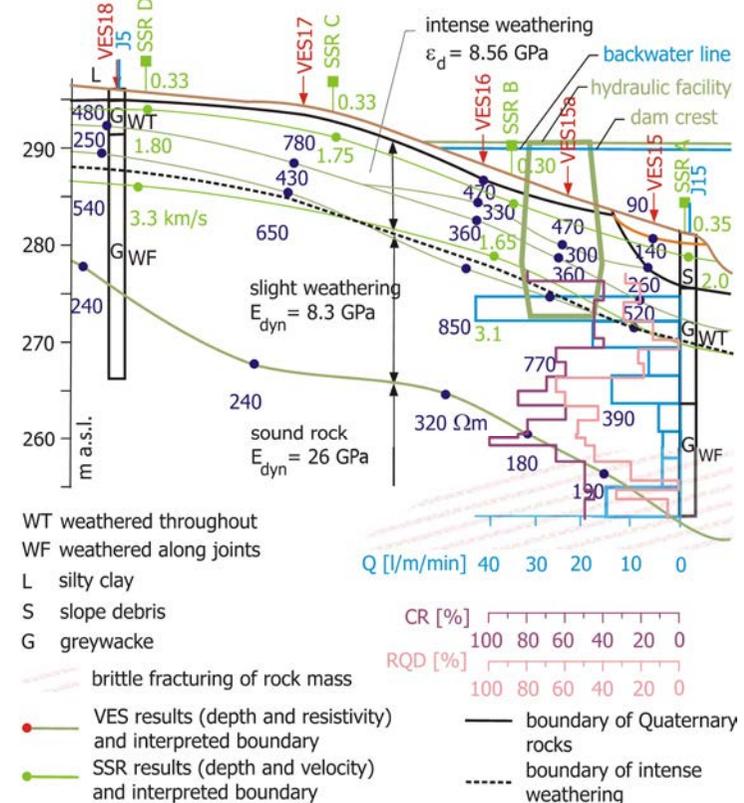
Survey for the hydraulic facilities at the Tršice dam site
